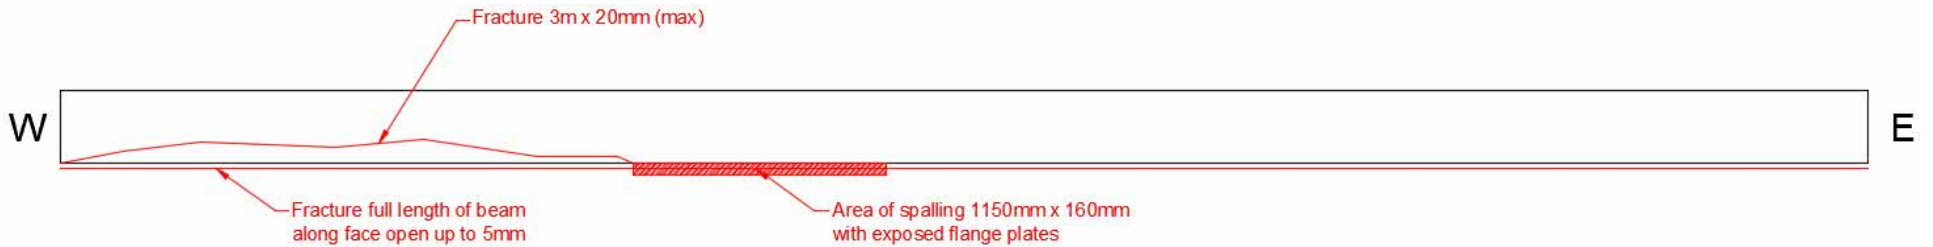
Plan View of Beam No.3 Defects (Photograph 9)
